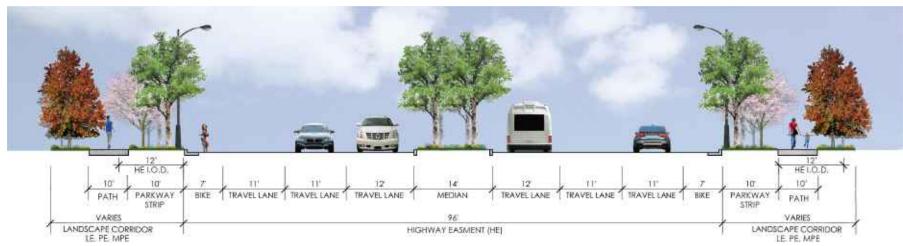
Foothills Boulevard - Section A, 6-Lane Arterial with I.O.D. for potential future 8 lanes
